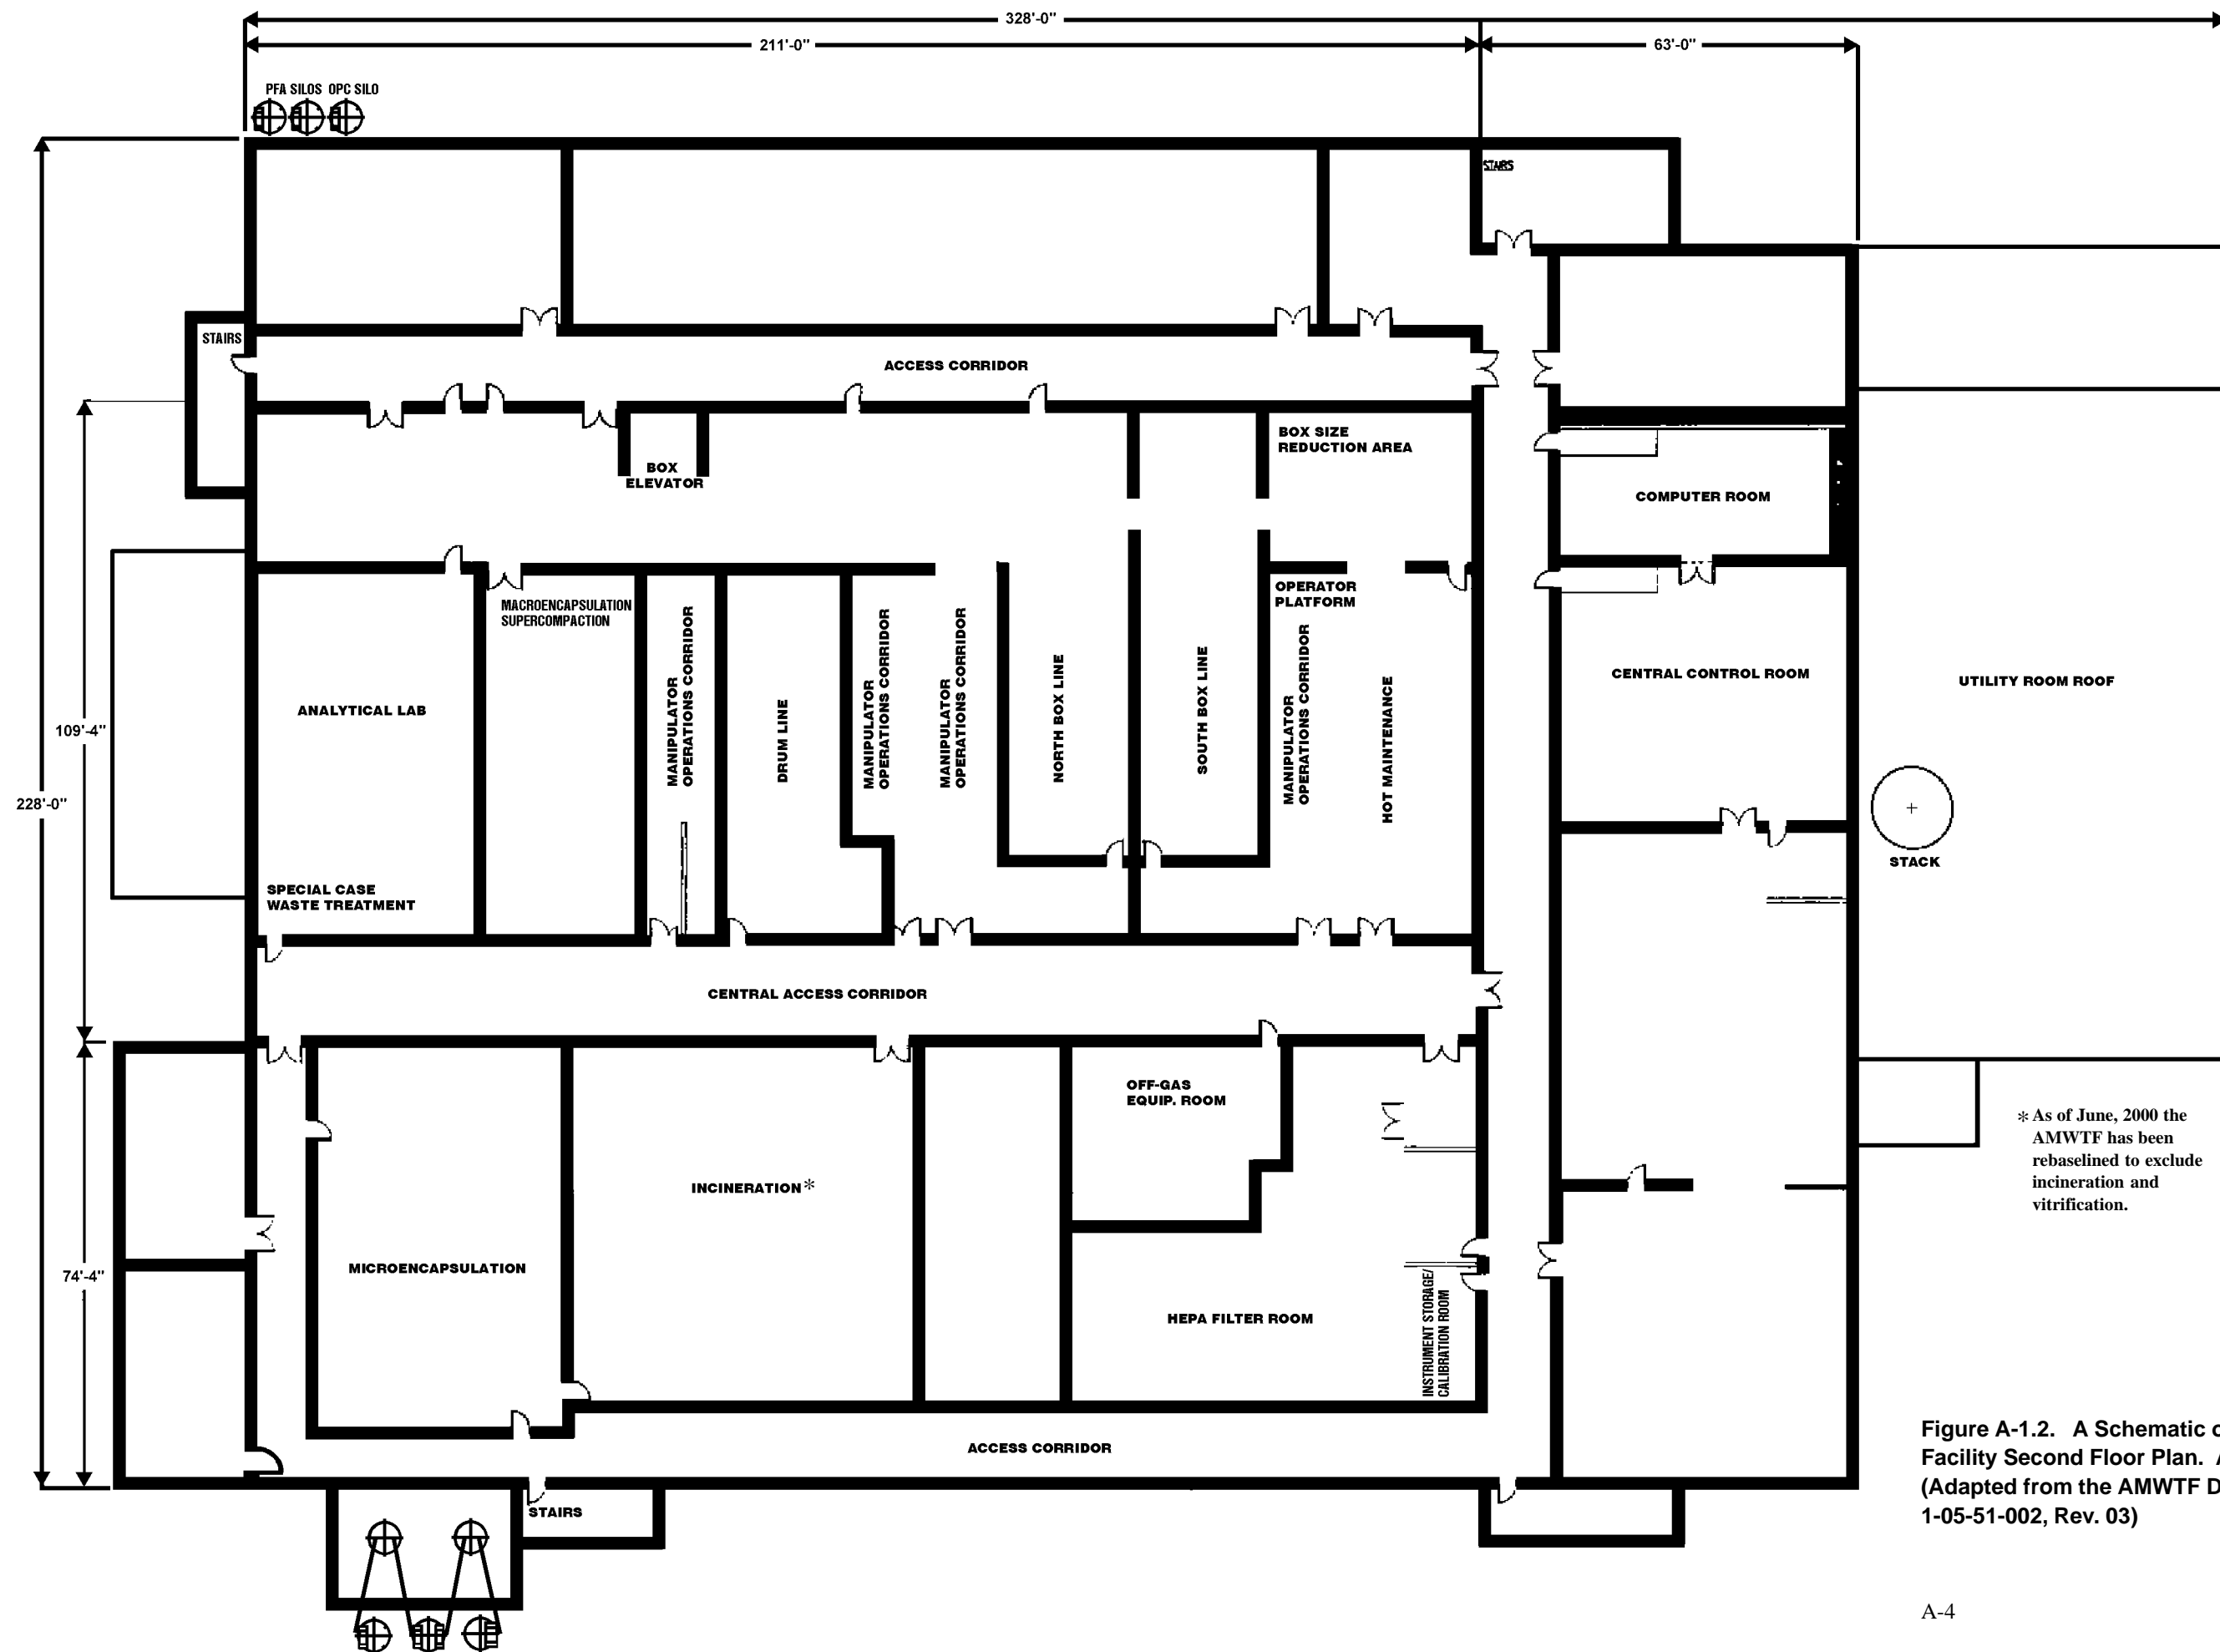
A Schematic of the Treatment Facility Second Floor Plan. AMWTF at INEEL (Adapted from the AMWTF Drawing Number 1-05-51-002, Rev. 03)
